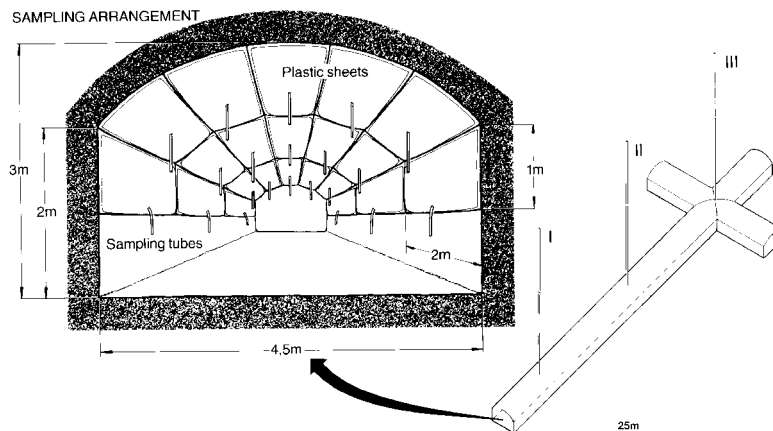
Layout of experimental 3-D drift at Stripa and sampling arrangement.
